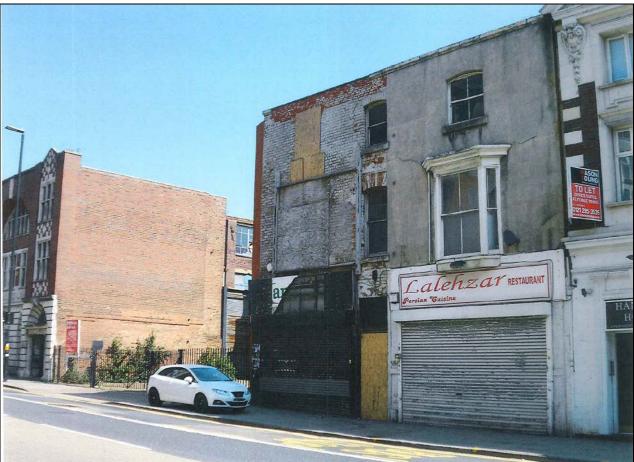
View of No's 12 and 11 Great Hampton Street proposed for demolition
